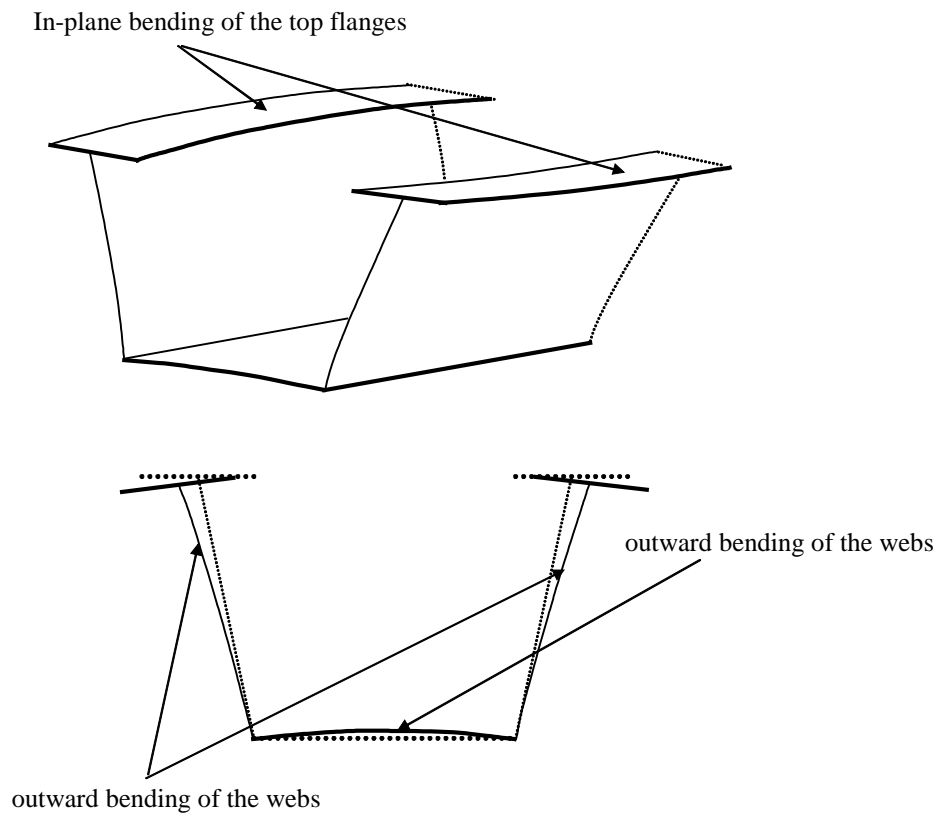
Bending distortion of an open-section trapezoidal box girder
